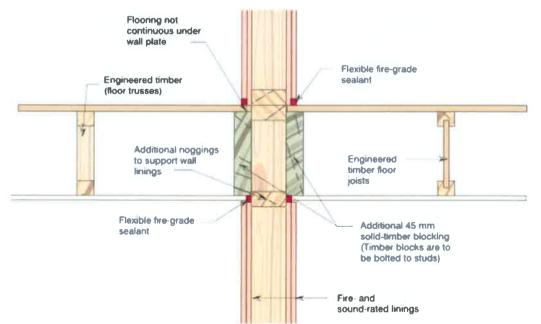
Excerpt from design guide showing joist parallel to wall with single wall stud continuous through junction with timber blocks providing an FRL of 60 minutes
